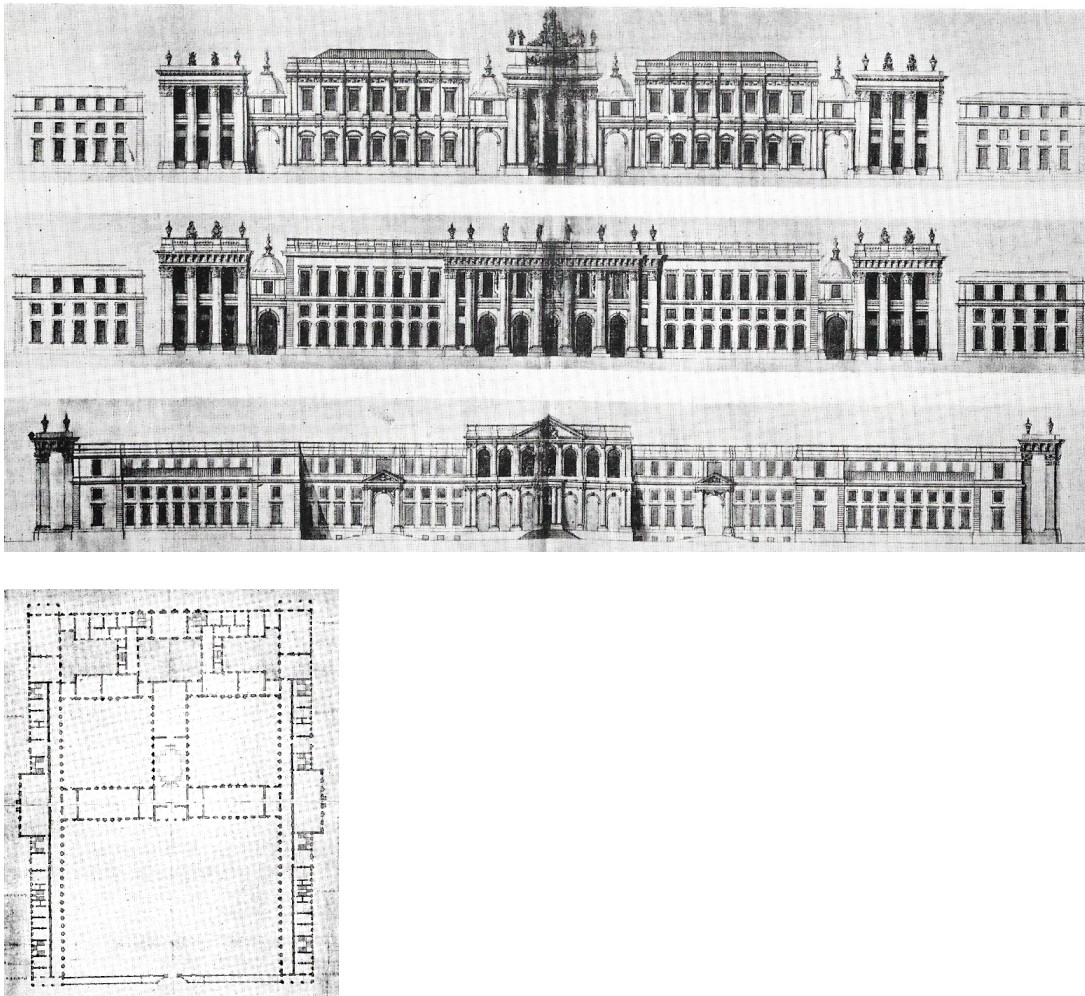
Whitehall Palace 2nd great design, (above) Elevations, (below) Plan (Image: Sekler, Eduard. *Wren and His Place in European Architecture*. London: Faber & Faber, 1956)
